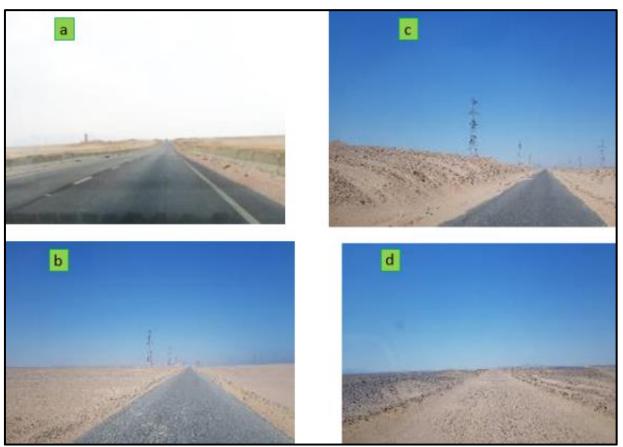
A) Zaafarana-Hurghada Road, B) External Road 1, C) External Road 2 and D) Internal Road
